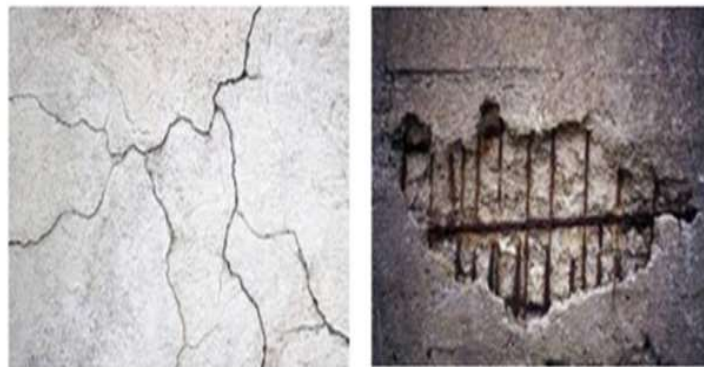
Spalling and Shrinkage Cracks at Initial Stage . a) Spalling in Concrete, b) Shrinkage Cracking at Initial Stage
